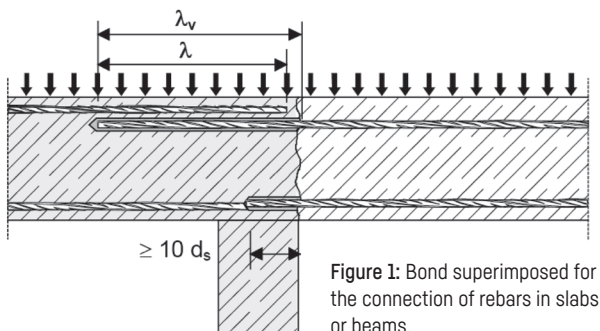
Bond superimposed for the connection of rebars in slabs or beams.
